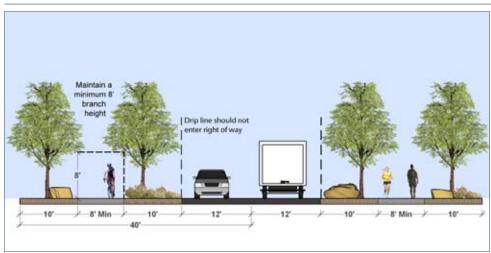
Proposed Arnold Boulevard Cross Section
